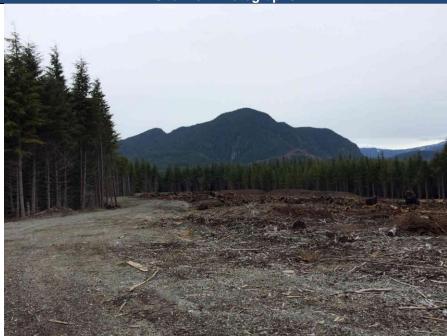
Proposed Refinery Site, looking Northwest on Wedeene FSR (Lat: 54.172879, Long: - 128.686069)
